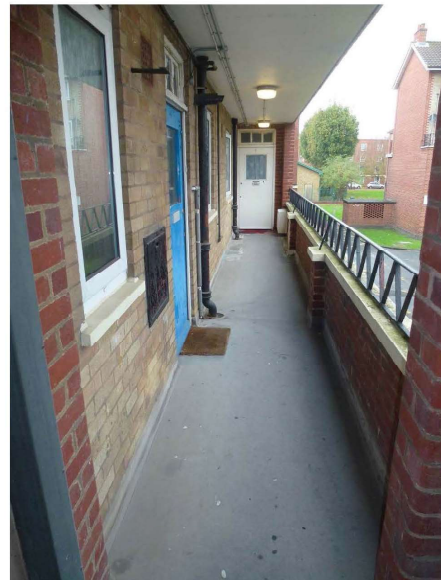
Ramsey House – Typical entrance and access balcony elevation.
